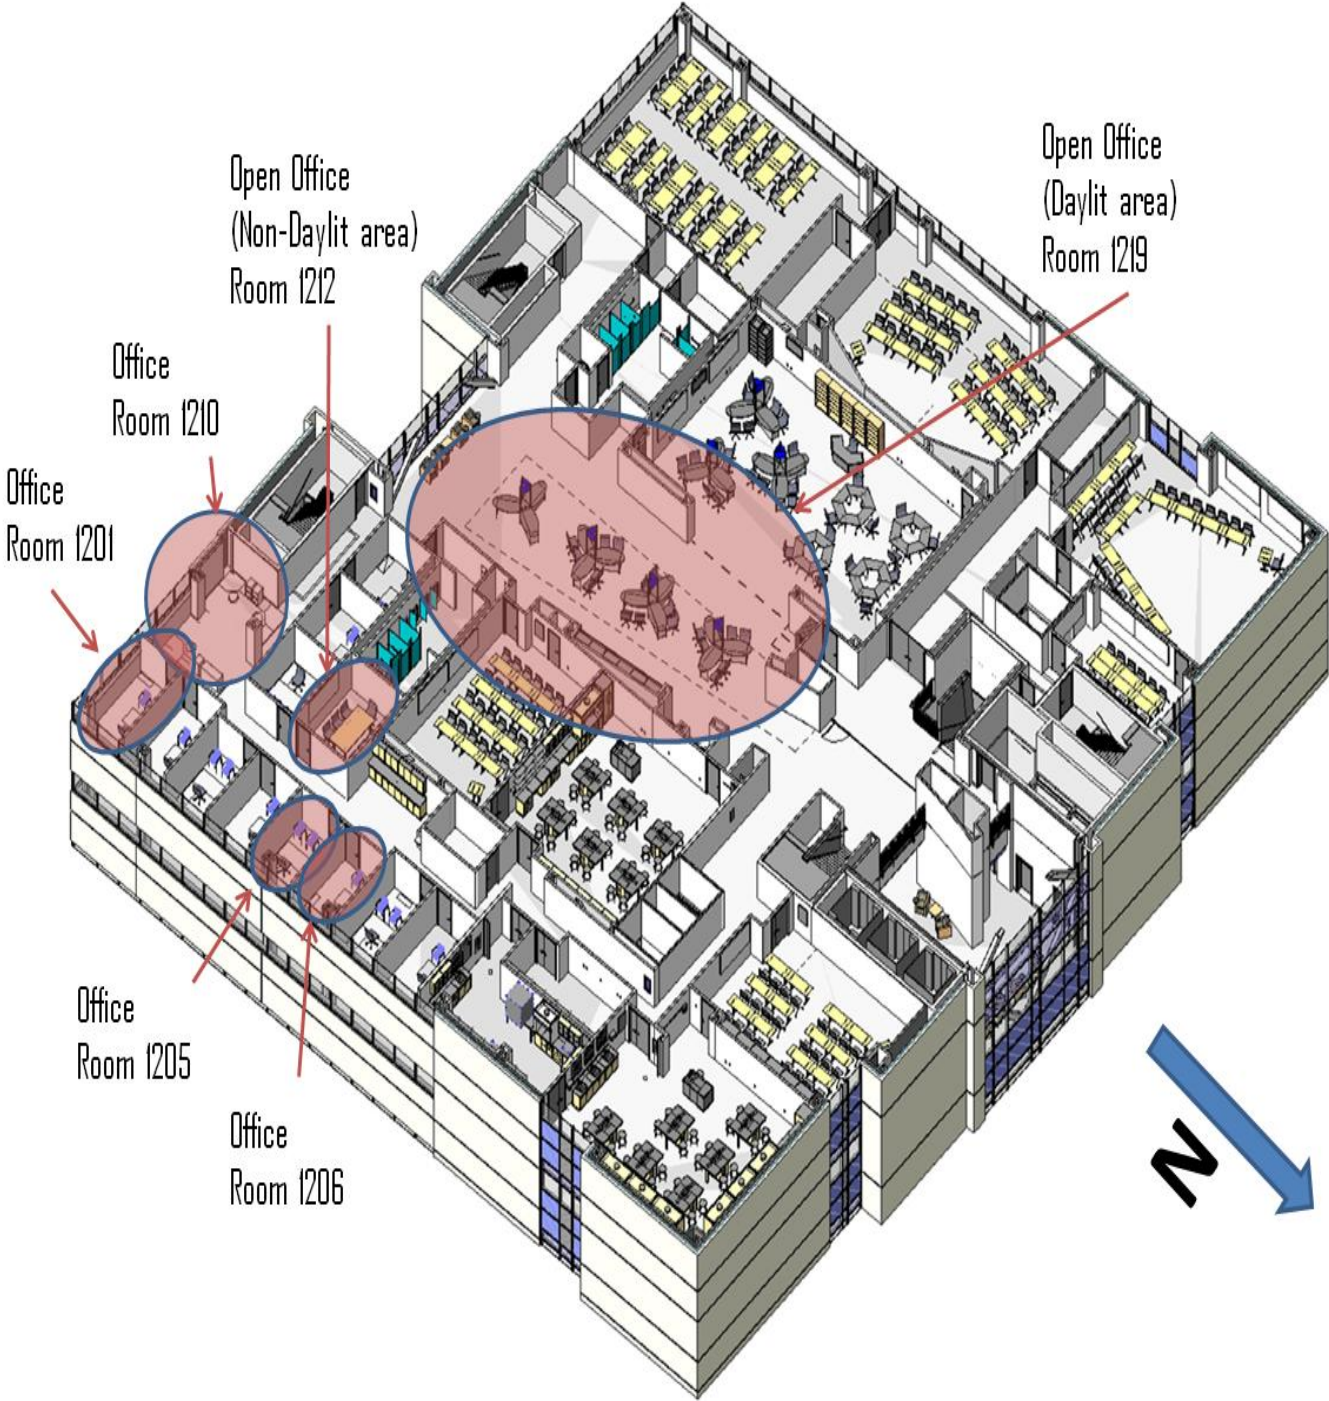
12th Floor Axonometric Plan Showing Rooms in Calculation
